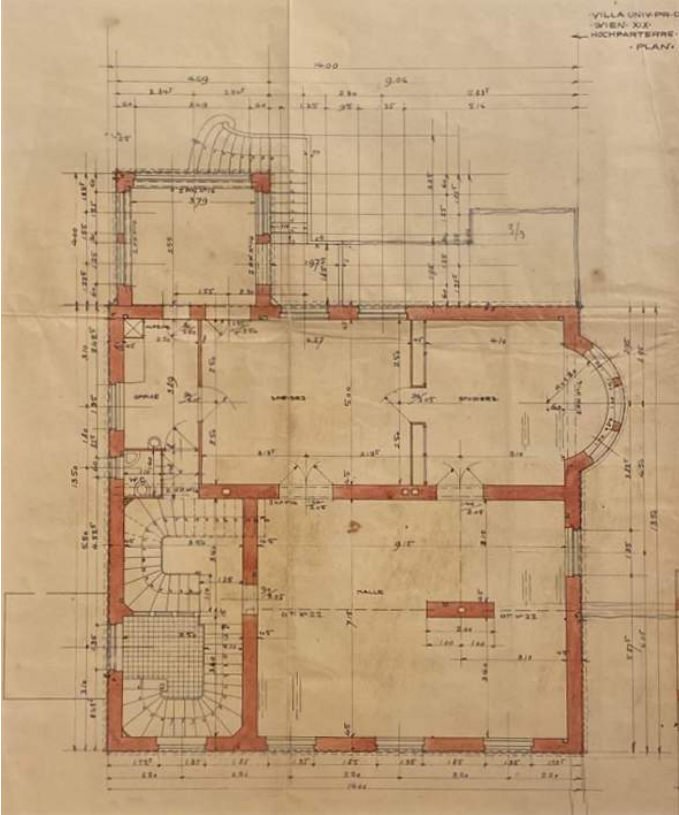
Detail of Hoffmann's *Bernatzik Villa Floor Plan (First Floor)
